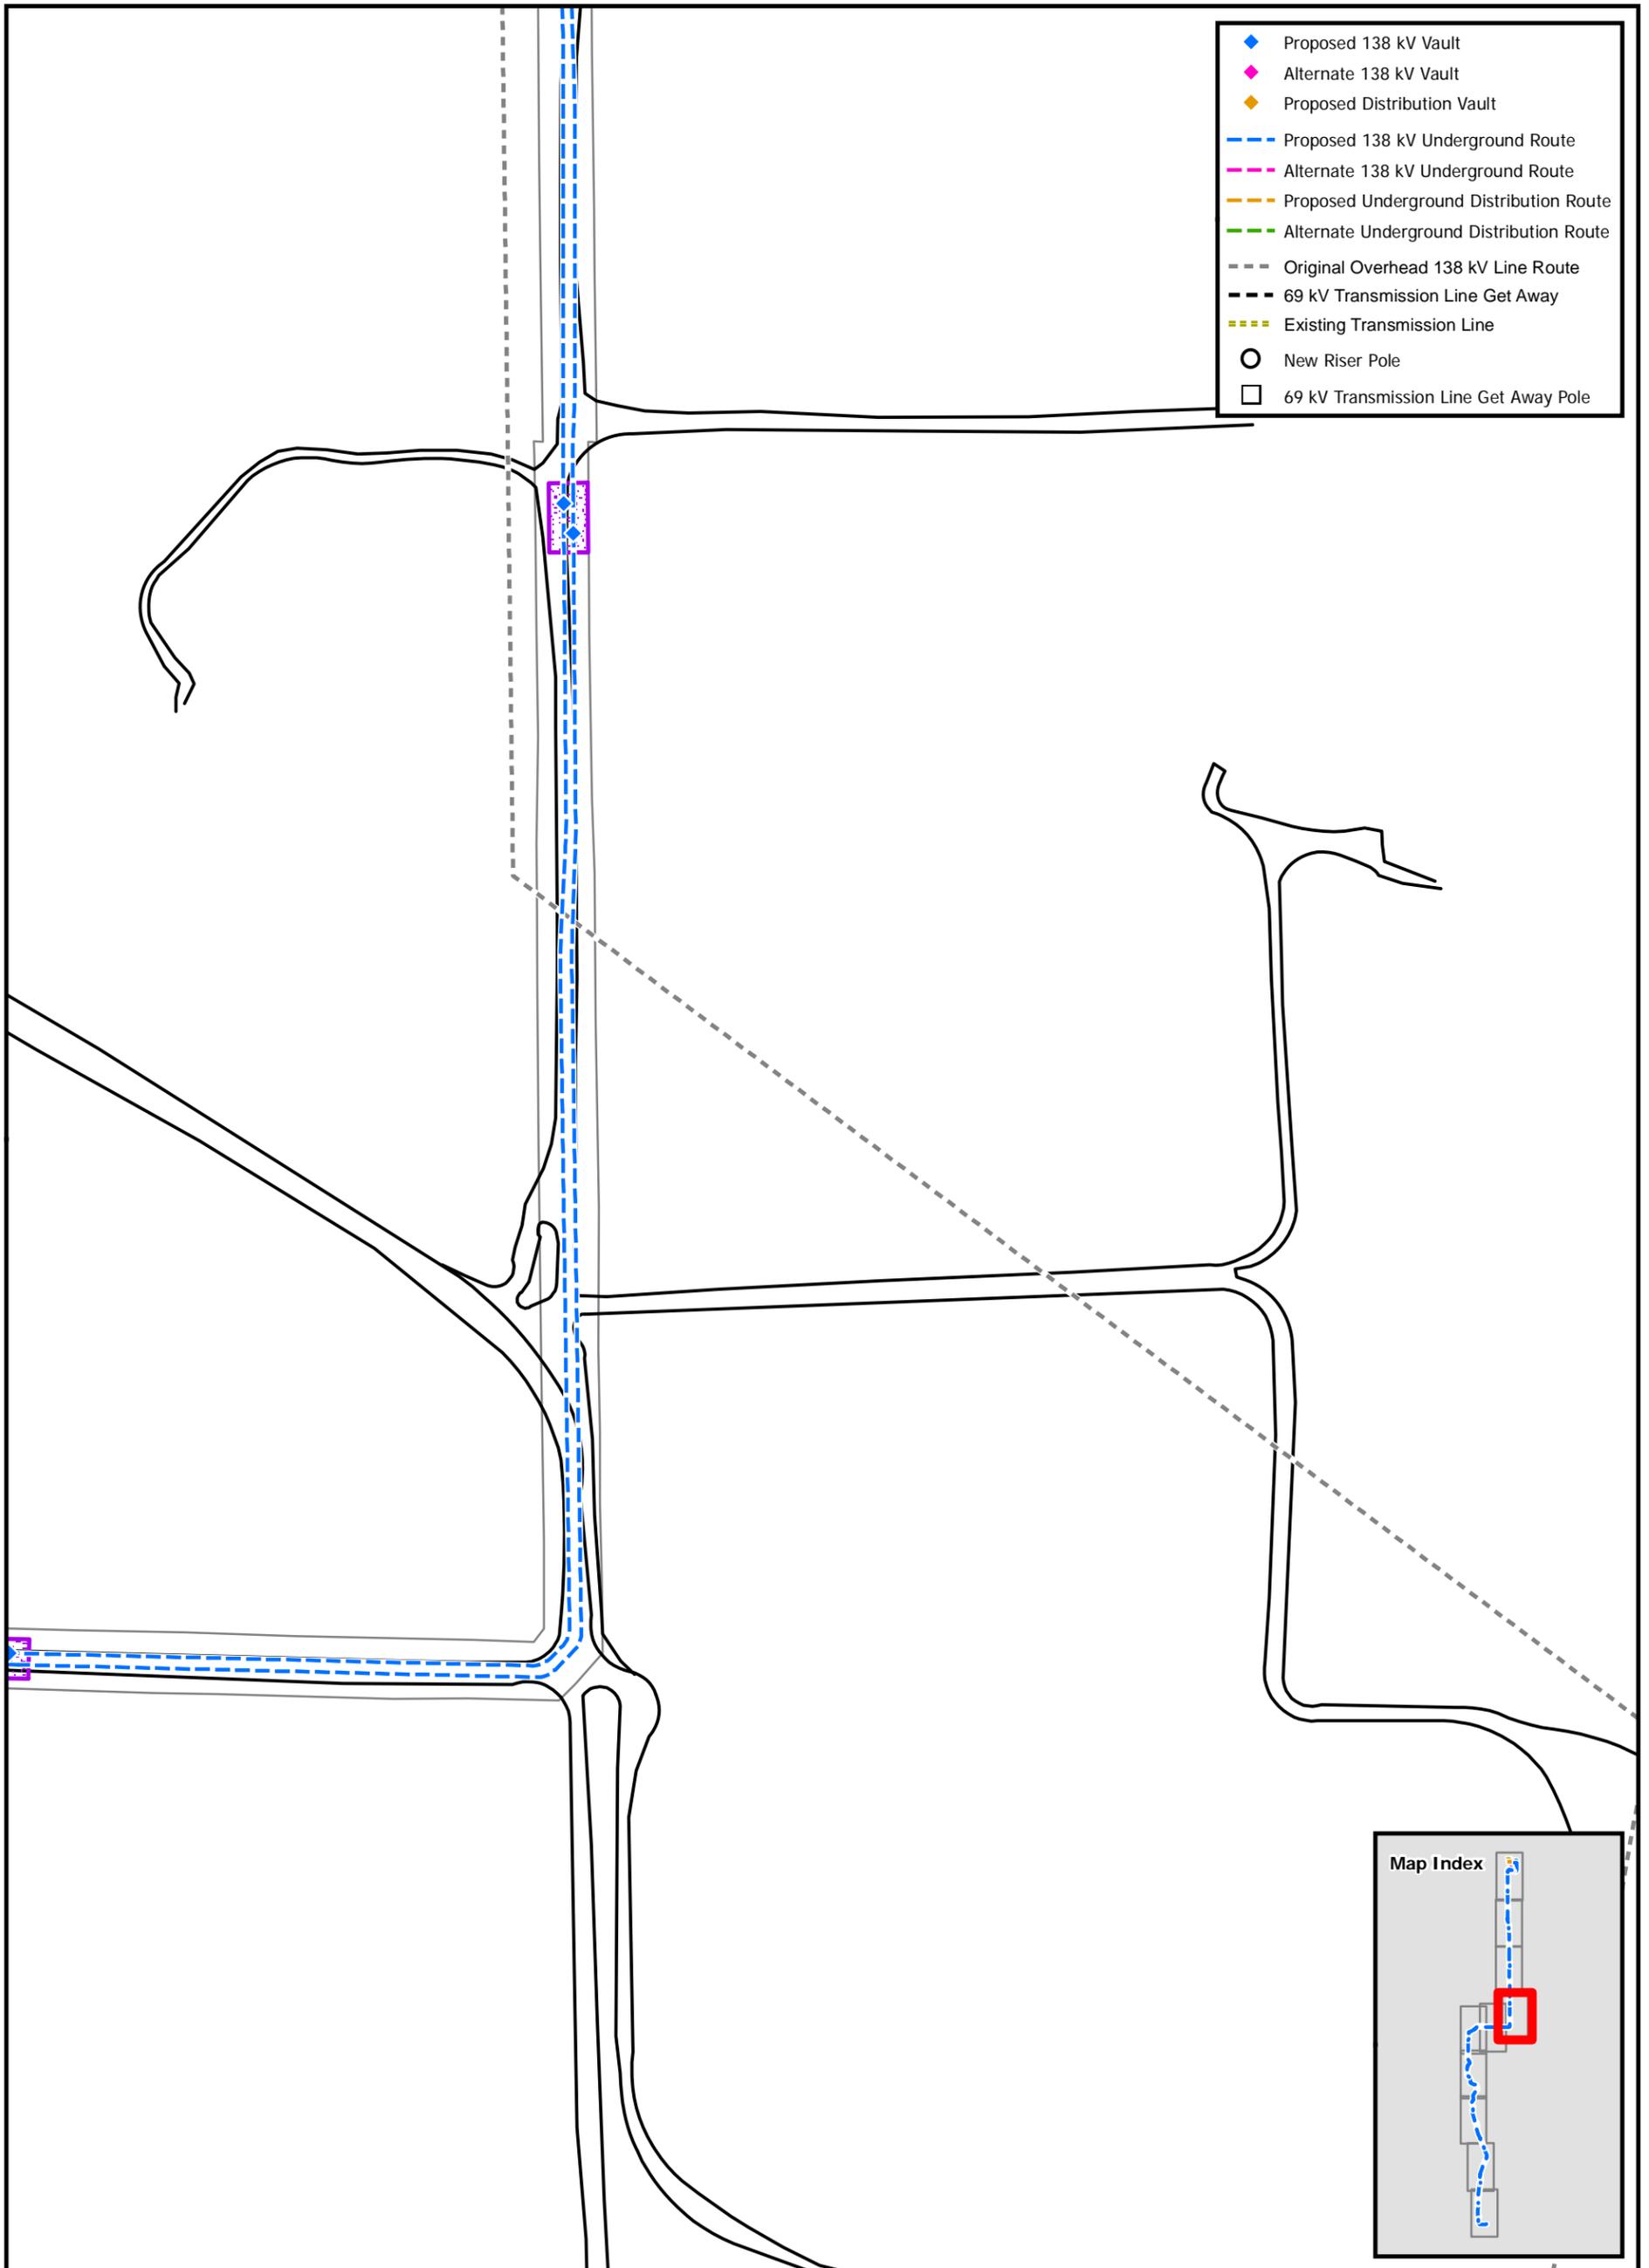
Preliminary Underground Alignment Drawing 4 of 10
